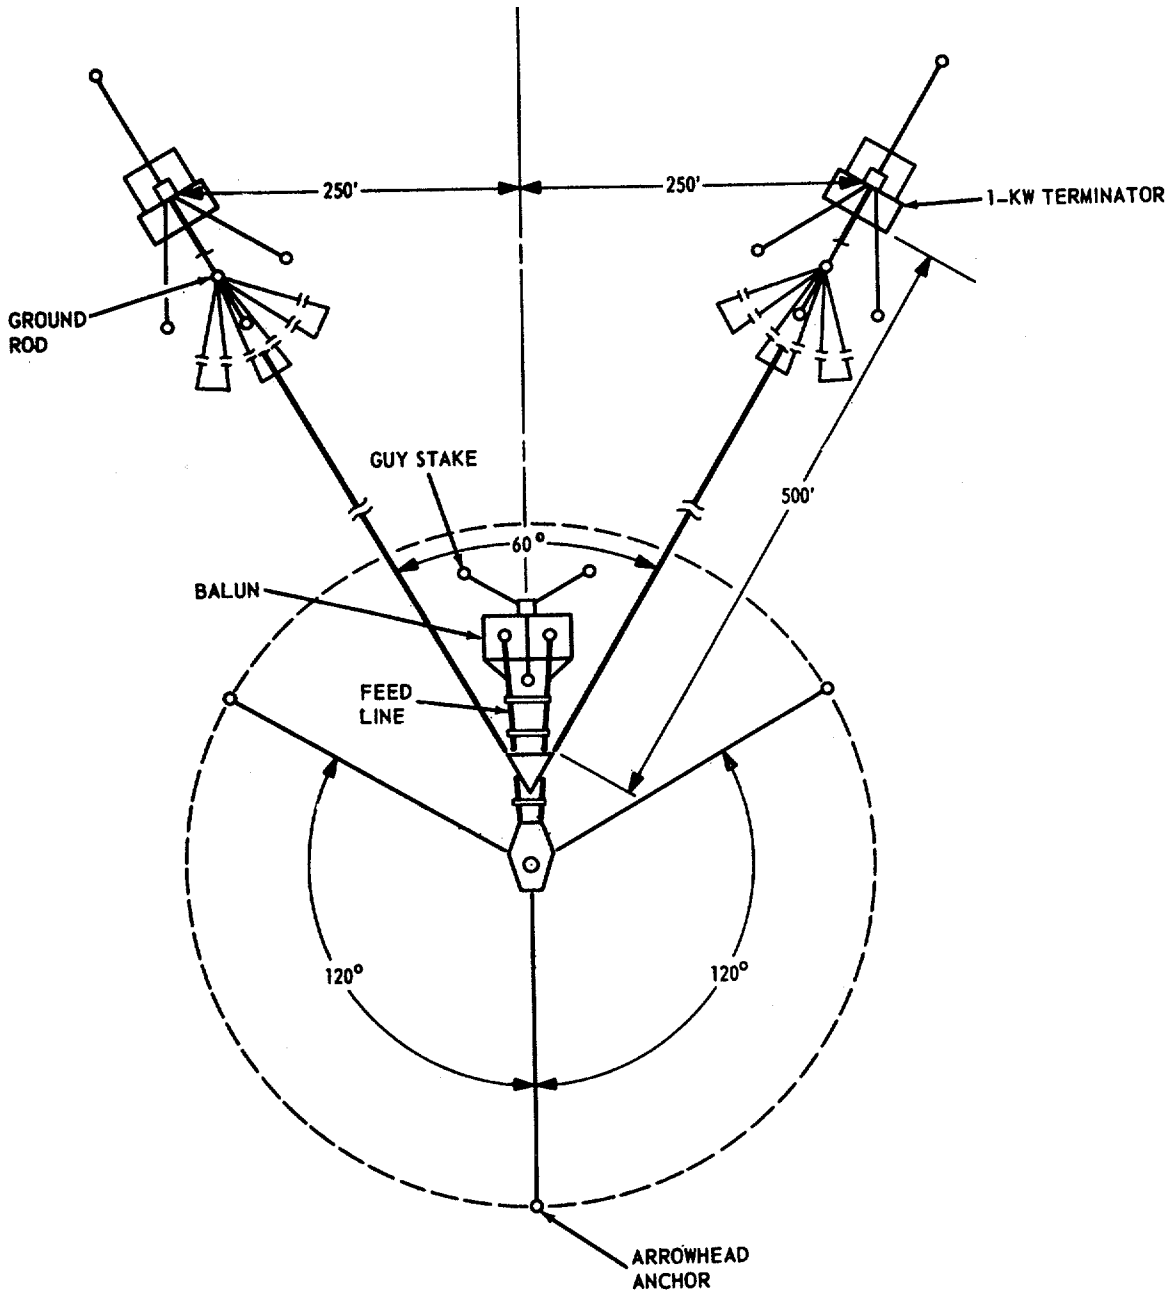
1-kw sloping vee antenna installation, plan view.
